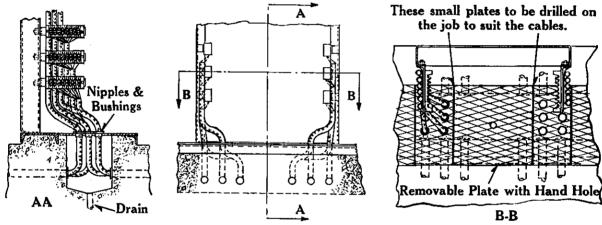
Conduits Terminating in a Trench. Cables are Brought to the Switchboard Through Bushed Holes in the Trench Cover Plates. Steel Panel Switchboard.
